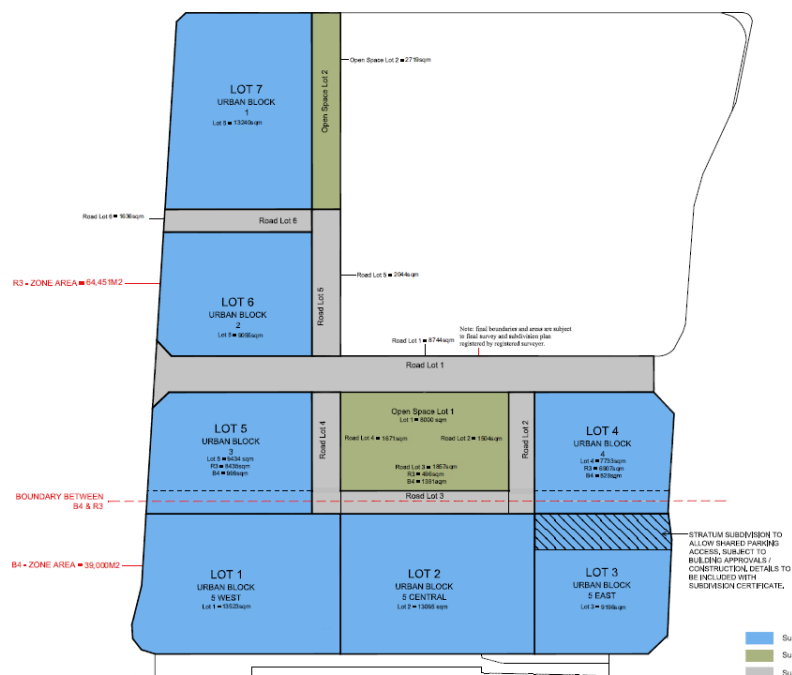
Approved Master plan concept subdivision plan DA-14/96
